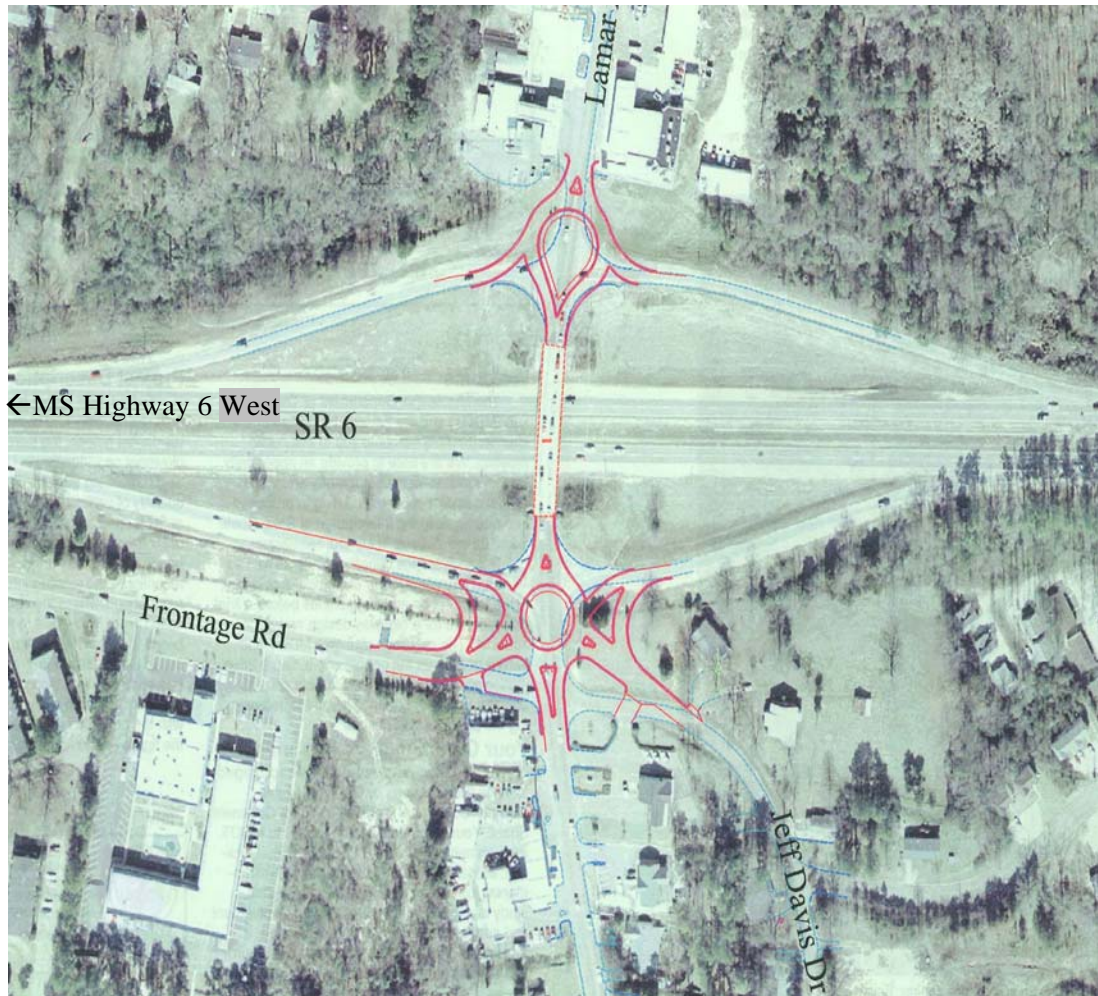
Planned roundabouts on South Lamar Blvd, Oxford
